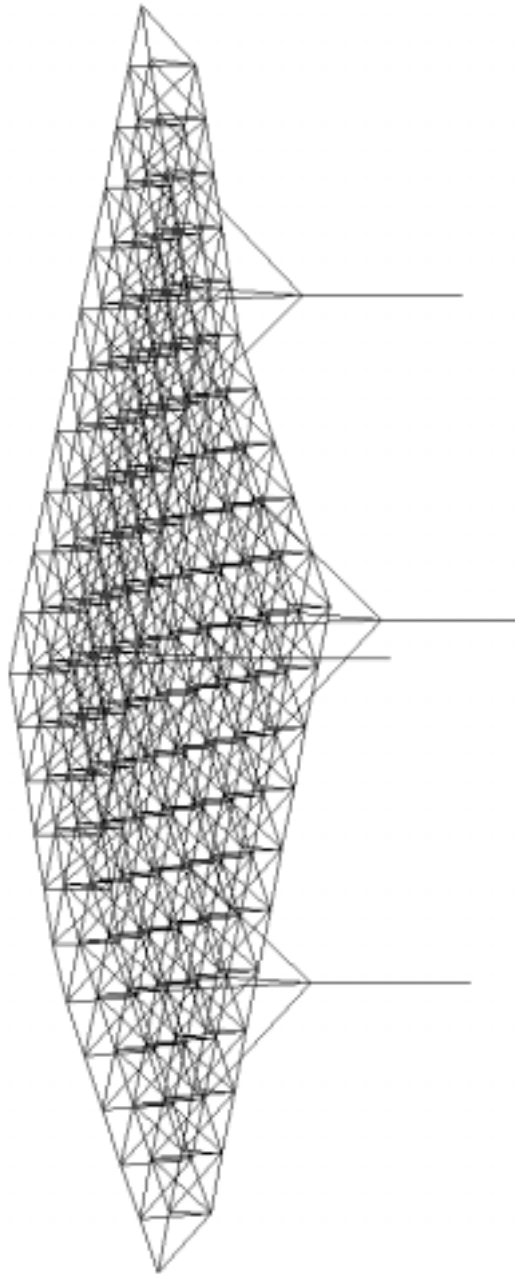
Concept of wood space truss structures constructed in Jungbu Forest Experiment Station
